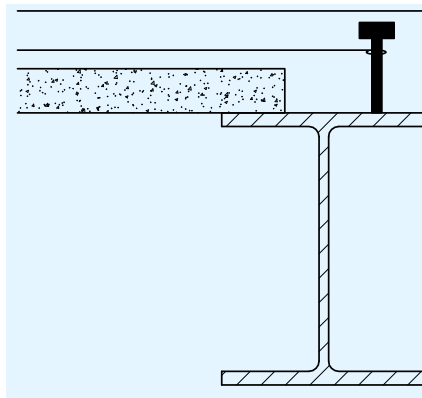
Possible connection between precast concrete plank and steelwork to ensure diaphragm action of the floor
